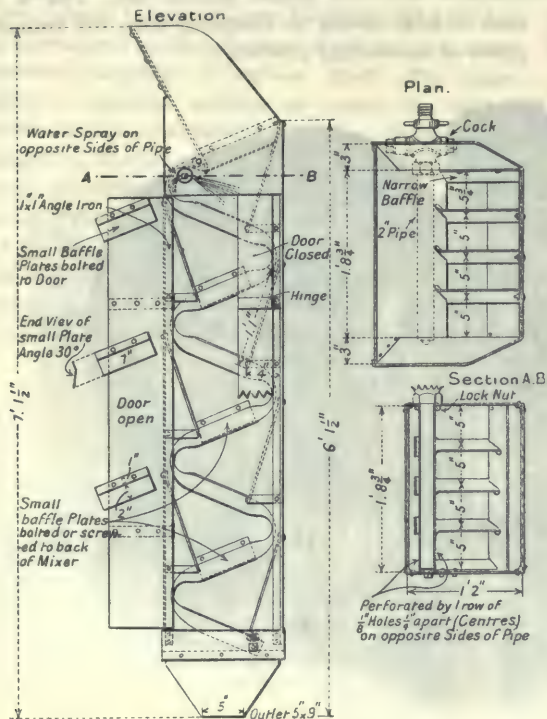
ELEVATION, PLAN AND SECTION OF "PERFECTION" CONCRETE GRAVITY MIXER.
